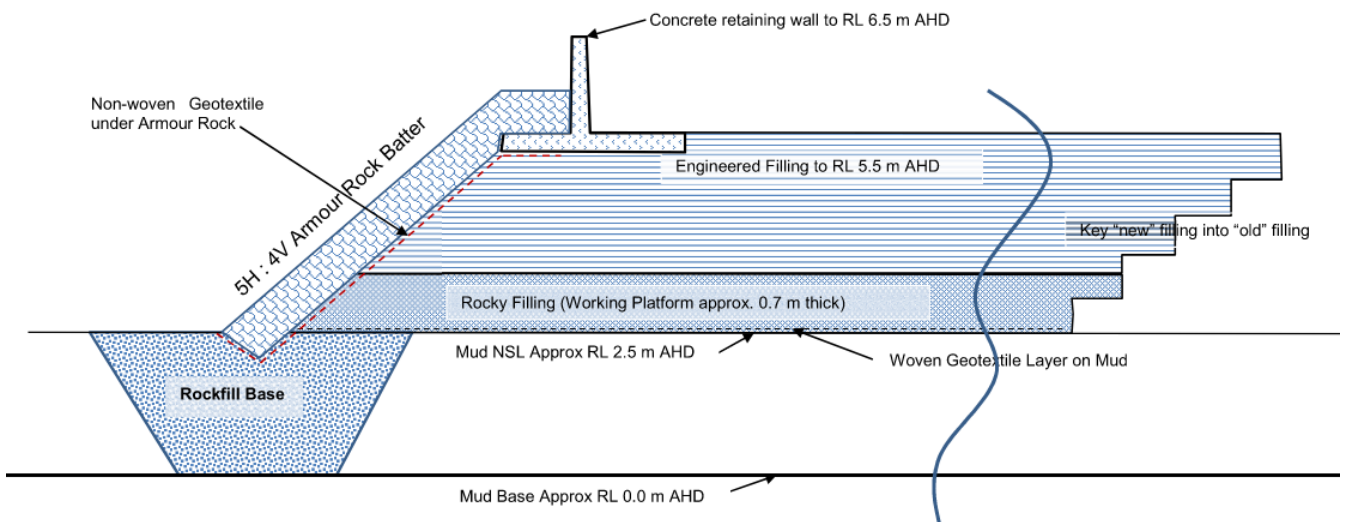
Proposed Final Earthworks Design – Lot's A and C
